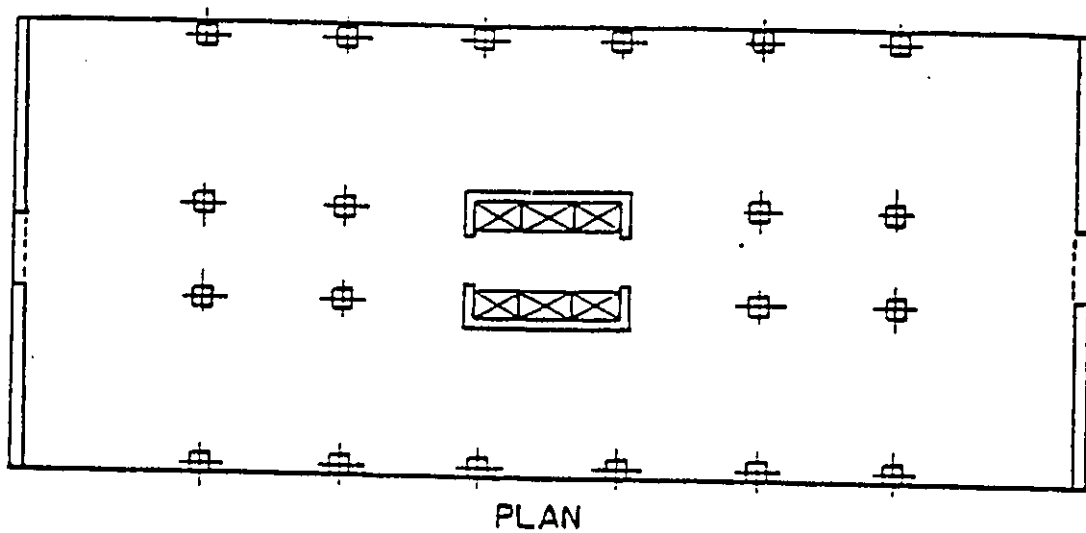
Common Use of Coupled Walls in Office Buildings
